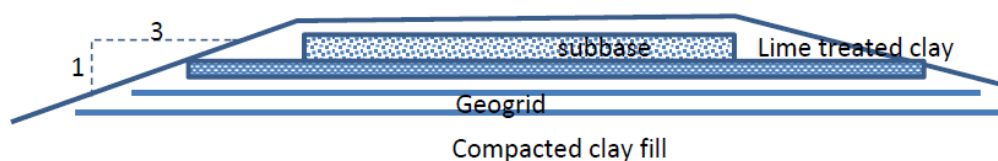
Possible cross section of an embankment with compacted clay fill
